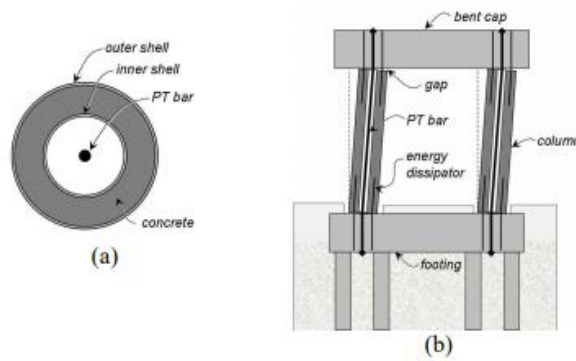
Self centering precast dual-shell steel rocking column retrieved from (Guerrini et al., 2015).
